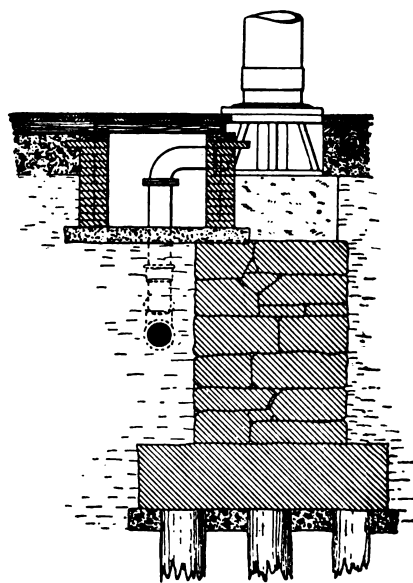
Vertical Section of Foundations at Right Angles to Fig. 2.
